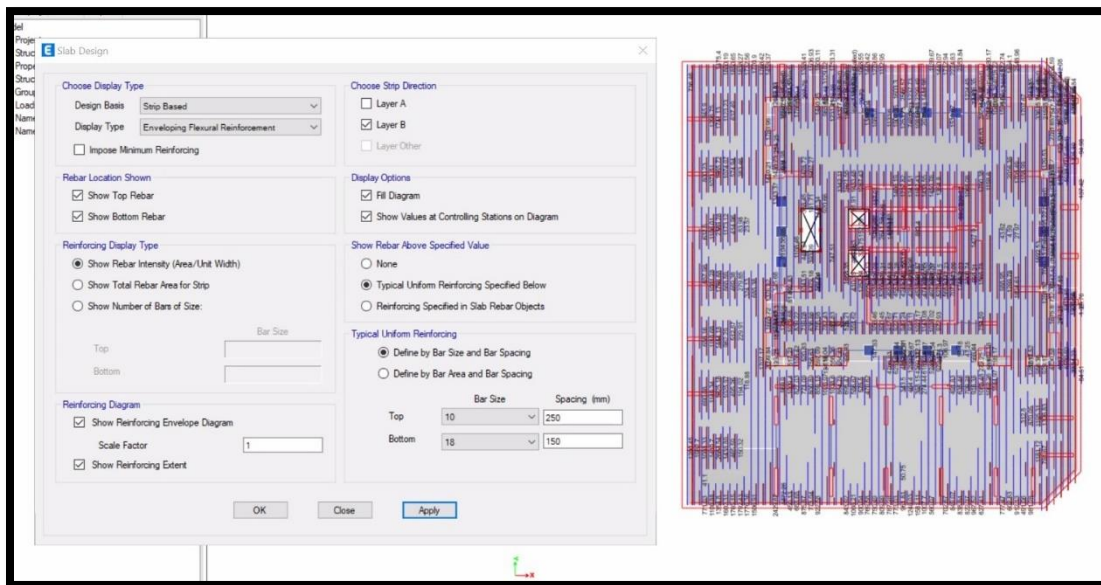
Bottom Reinforcement in Y-Direction for Ground Floor
